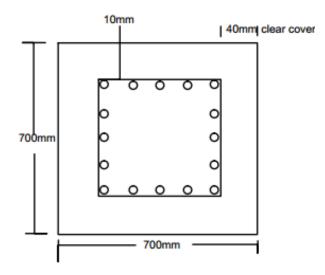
b Reinforcement Details Pedestal and Base Plate Middle Column
